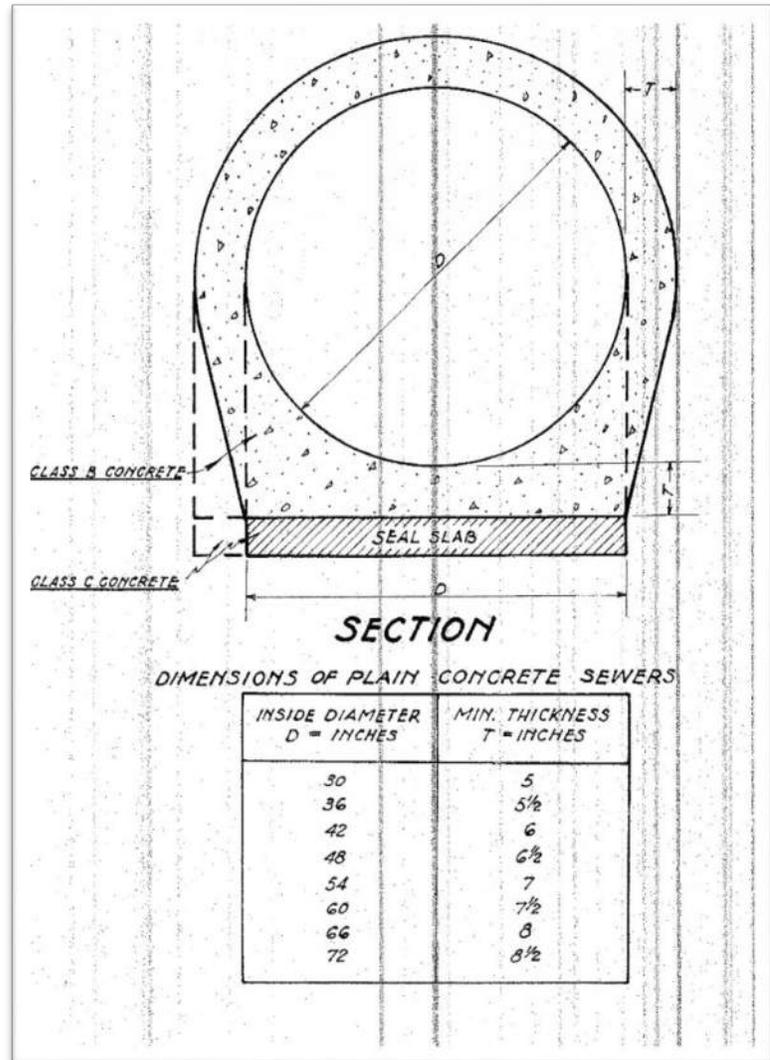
Typical Section, Monolithic Concrete Storm Sewer
